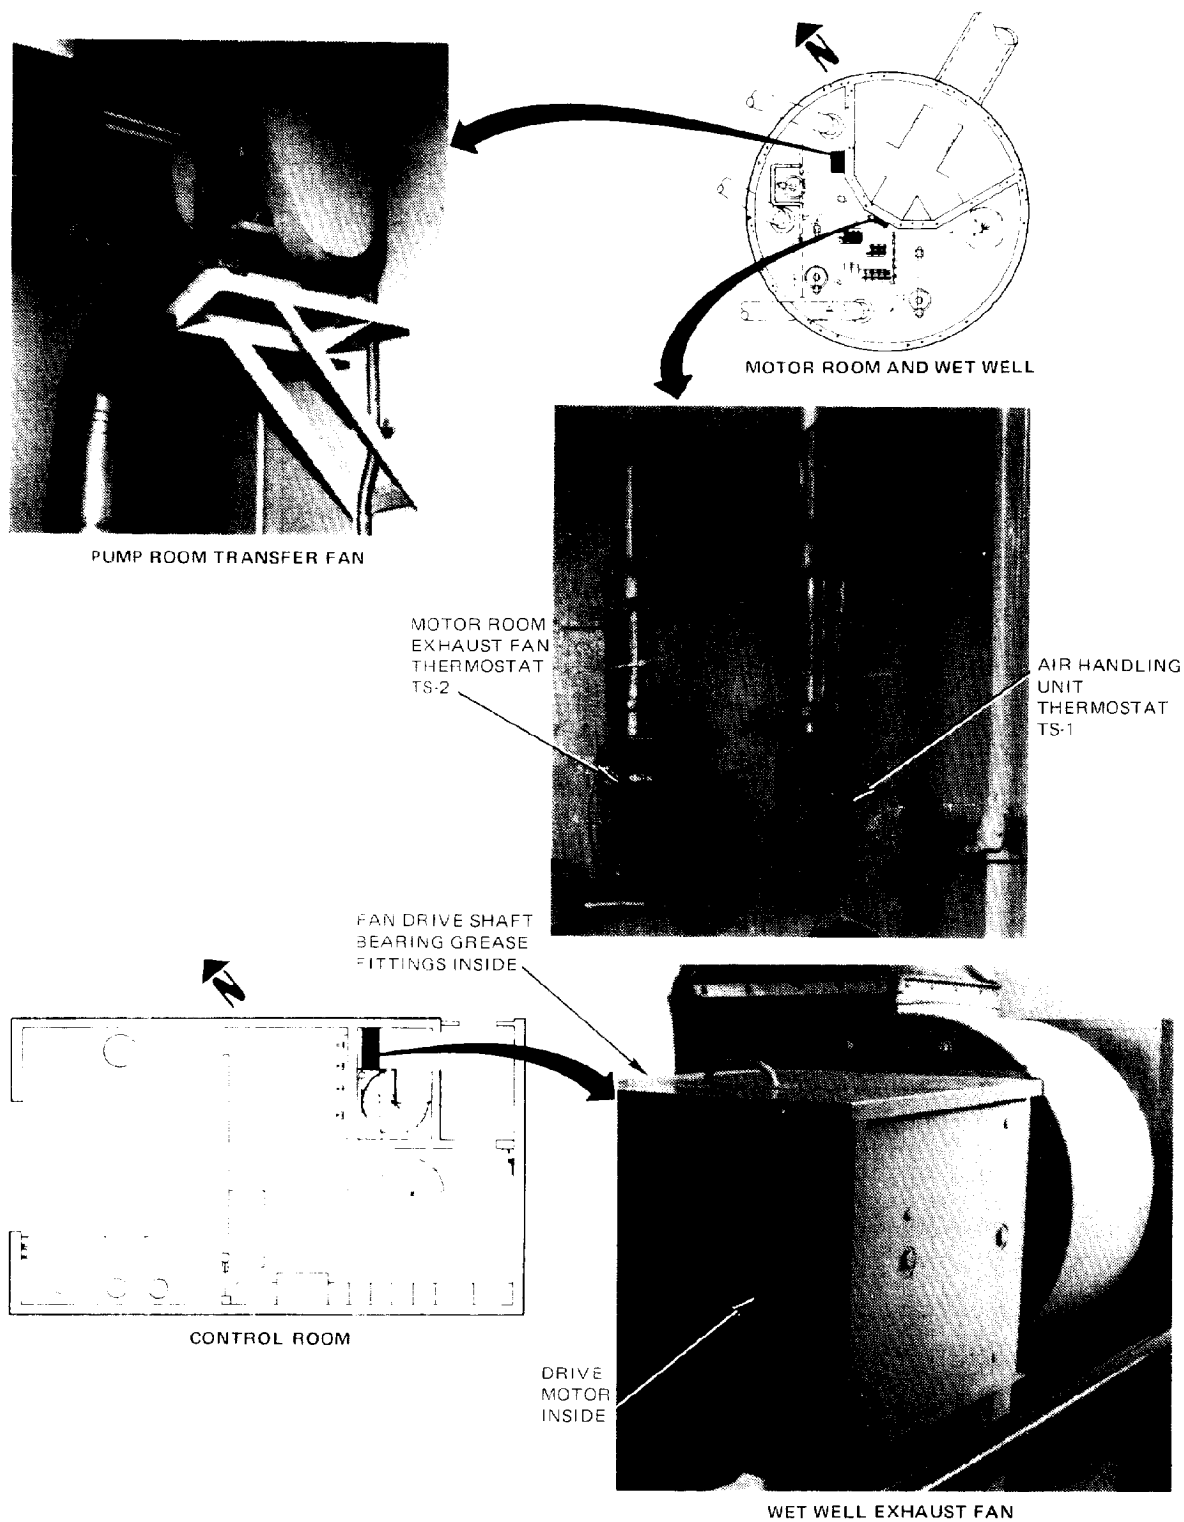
Heating and Ventilation System Equipment (Sheet 1 of 2)
